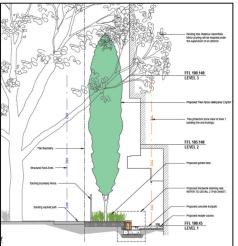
Typical section showing relative location of garden bed, retaining wall, footpath and steam
